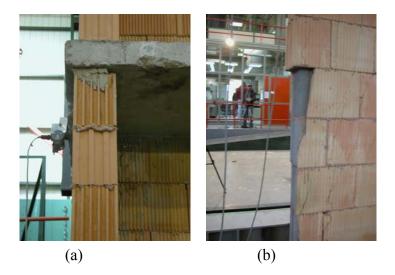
Specimen B3: Test 0.26g: Cracking through the height of 1st horizontal wall, partial collapse (a) movement of the slab of 1st level, (b) crushing of clay units.
